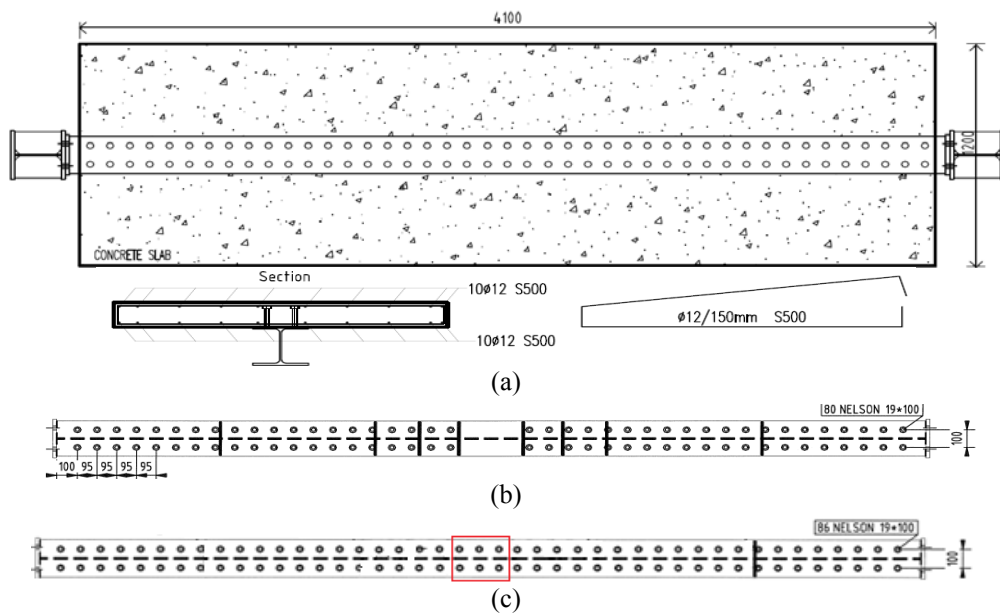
Details of the reinforcing of the concrete slab and disposition of shear connectors for the composite specimens (top view)
